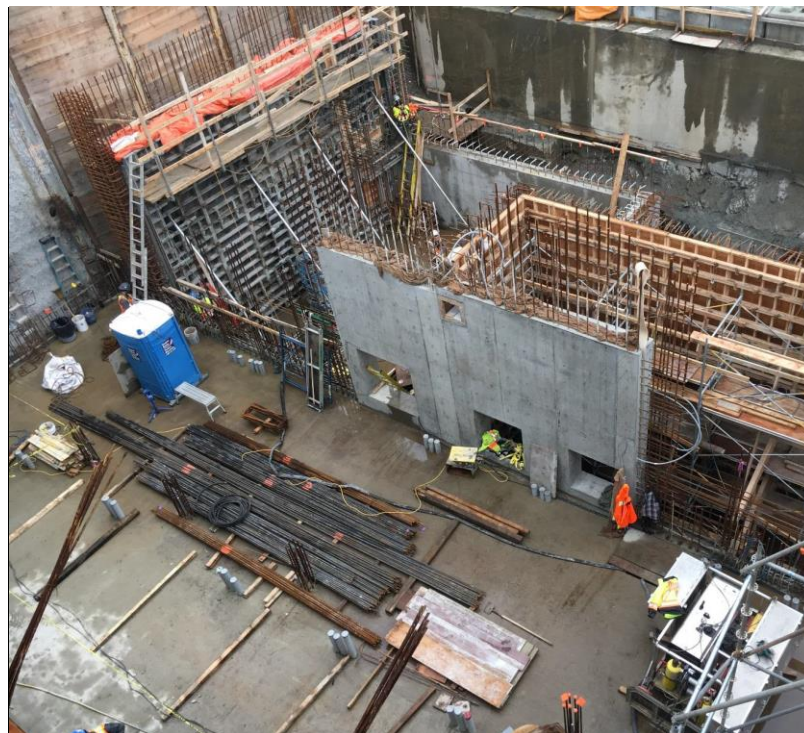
Clover Point Pump Station: wet well/pump room wall stripped.
